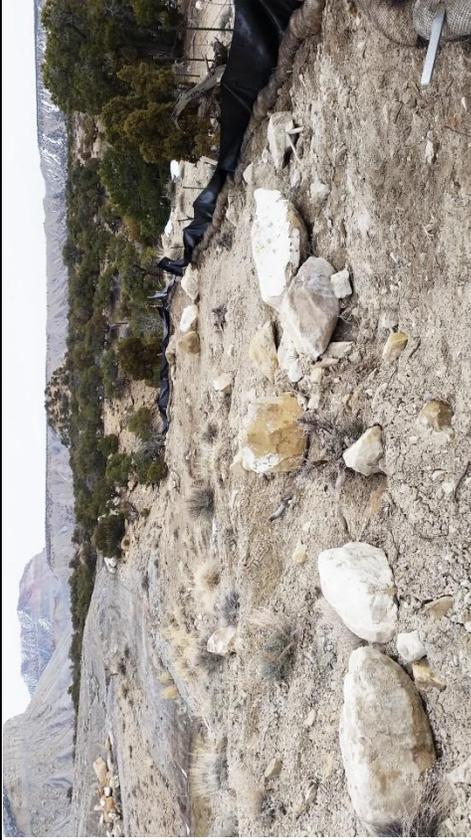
SILT FENCE, WASTE ROCK SITE
